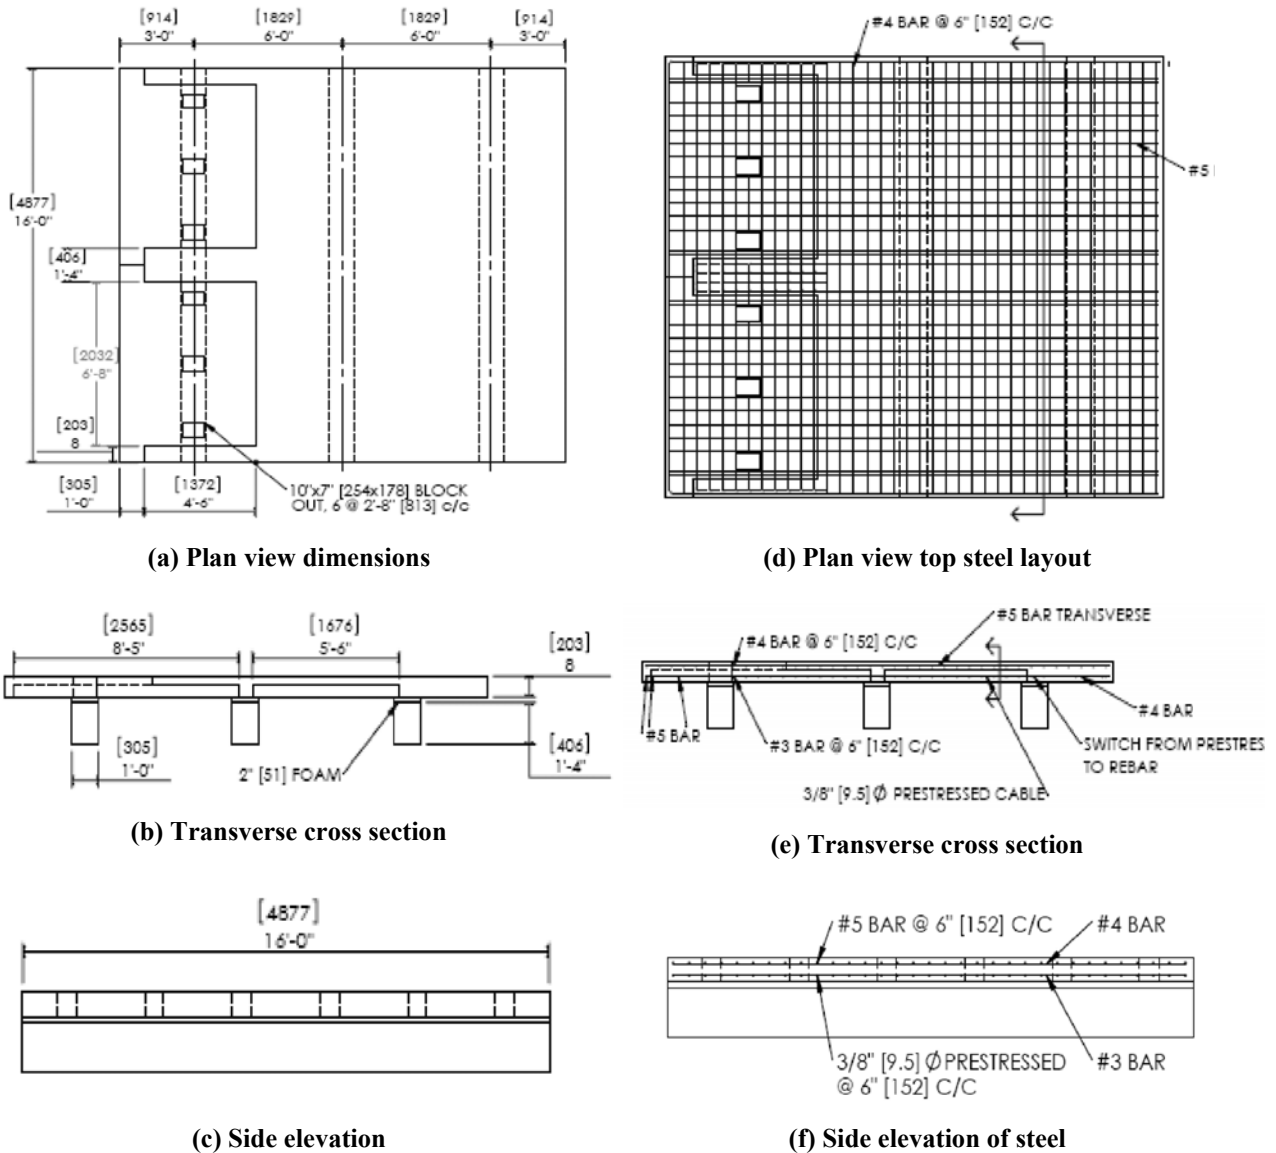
Dimensions and Steel Layout for Specimen 1.
